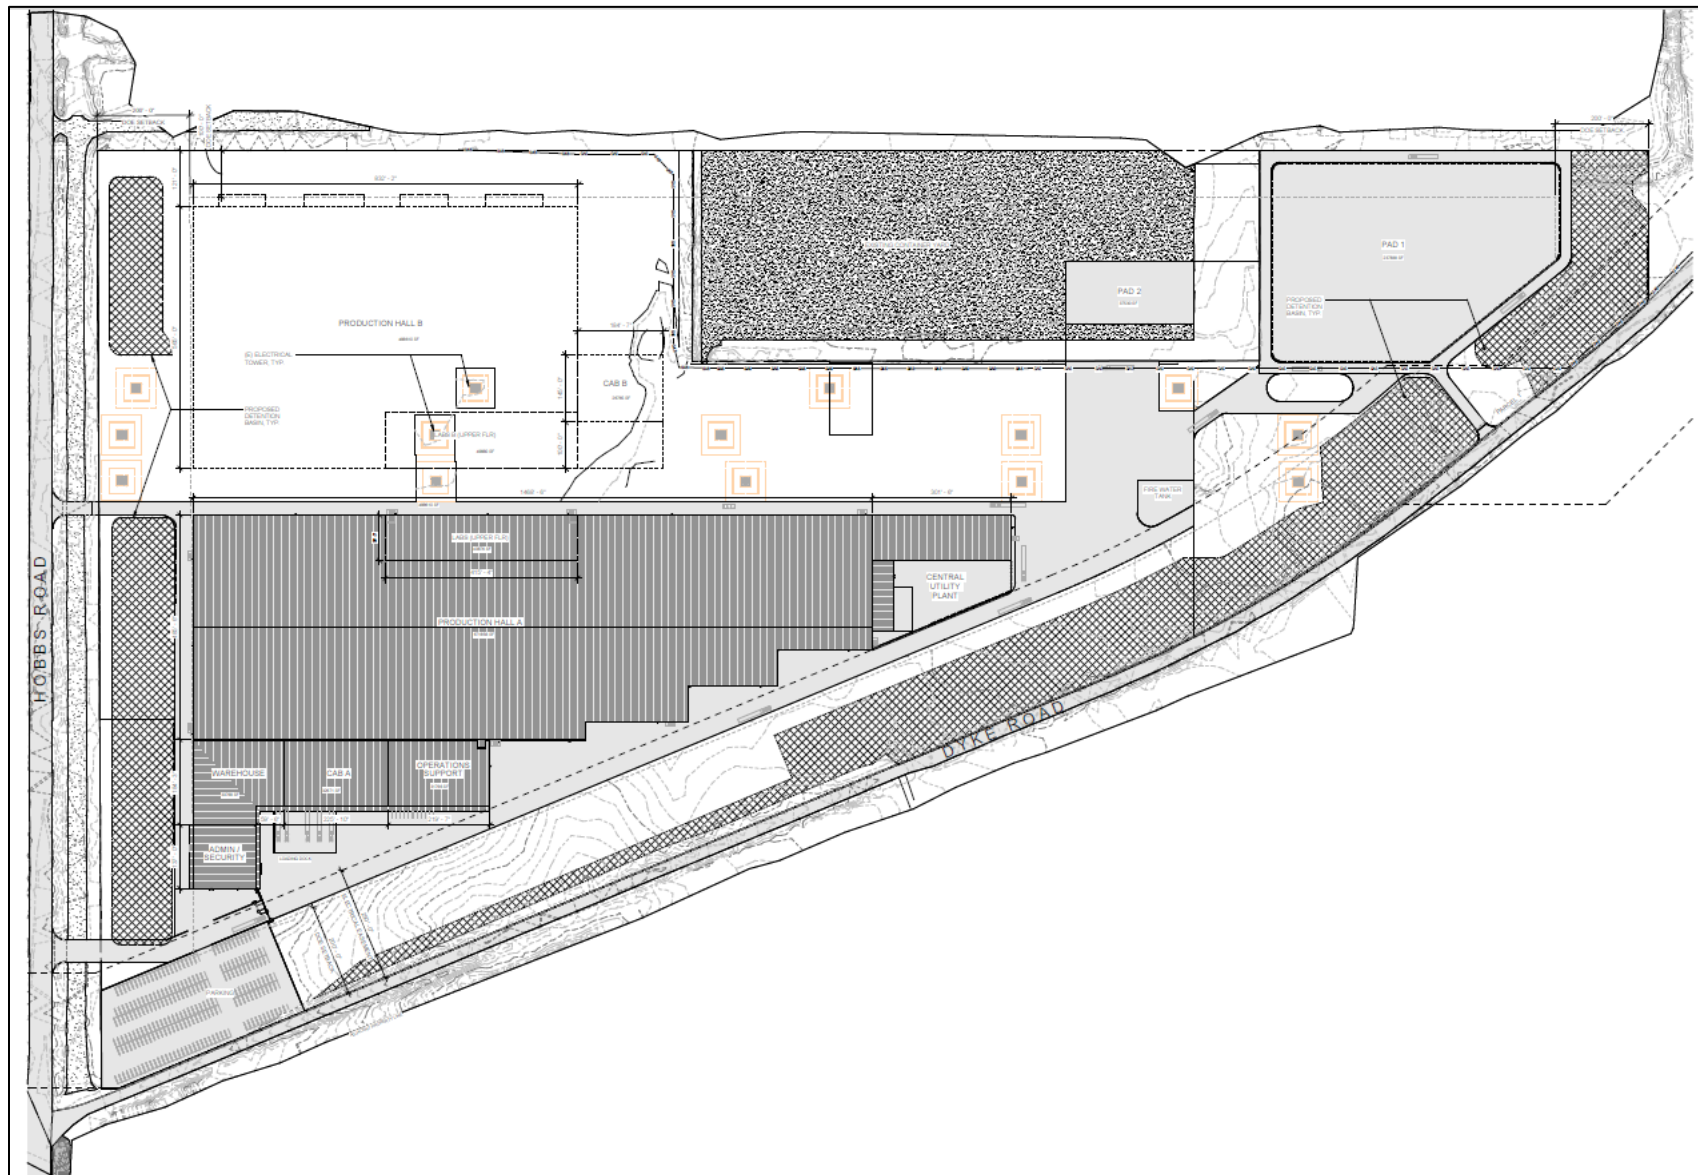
General Matter Paducah Enrichment Facility Conceptual Site Plan
